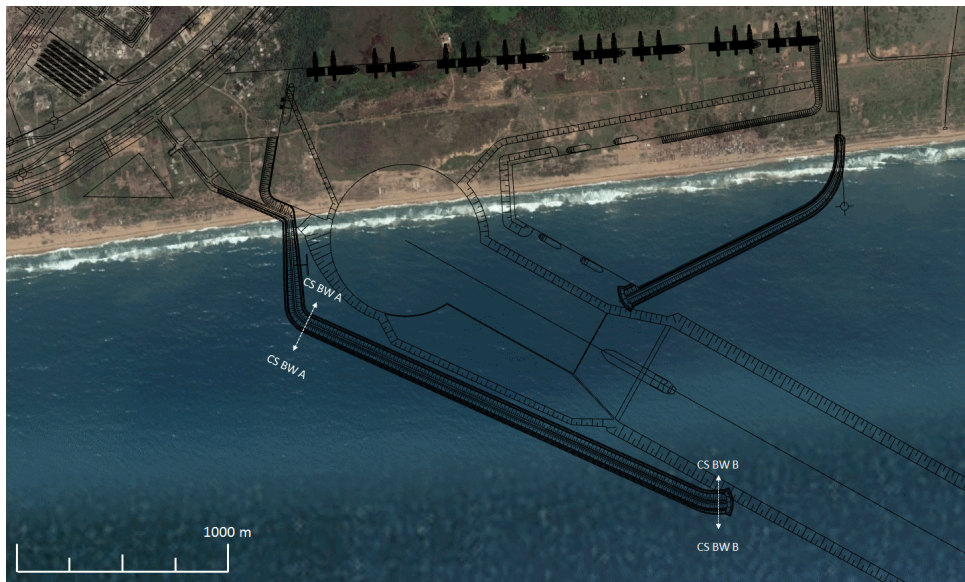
Overview of the conventional breakwater design with designated cross-sections along the breakwater.
